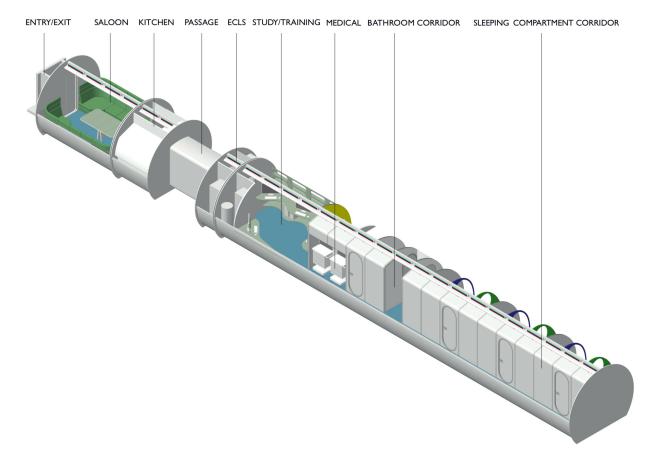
Cutaway Isometric View showing the Laboratory Architectural Layout
